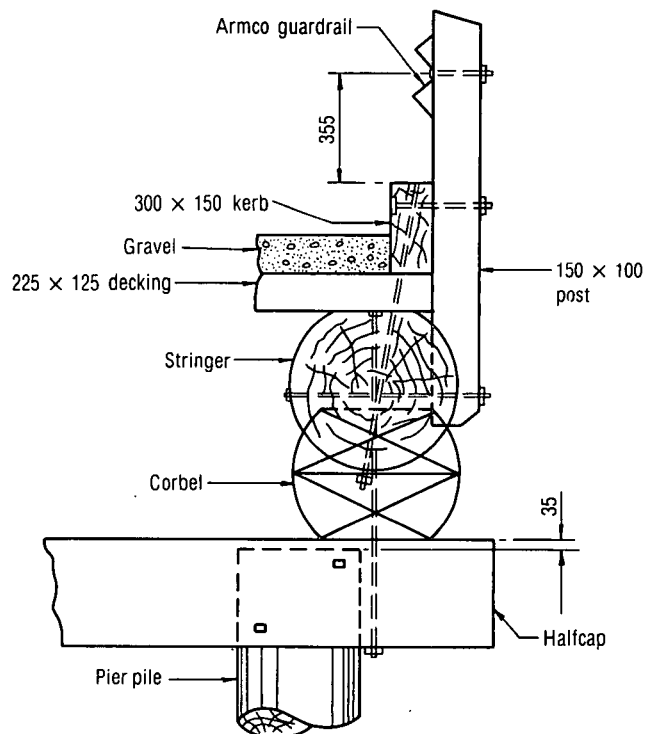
DETAILS OF KERB AND STRINGER BOLTING
